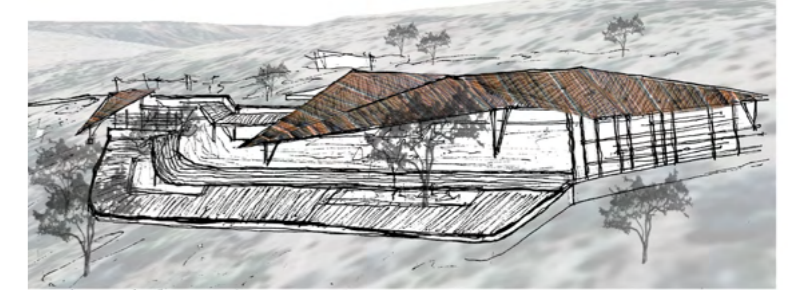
Market pavilion Proposal 1 (Author, 2021)
